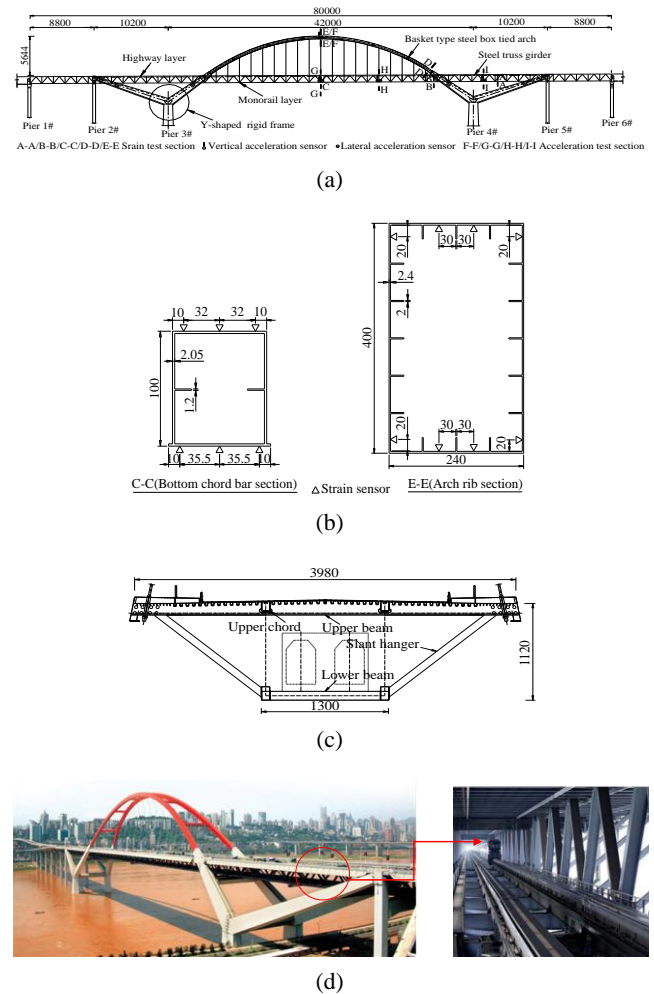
The Caiyuanba Yangtze River Bridge (unit: cm): (a) elevation view; (b) cross section of bottom chord (C-C) and arch rib at mid span (E-E); (c) cross section of steel truss girder at mid span (G-G); (d) overview
